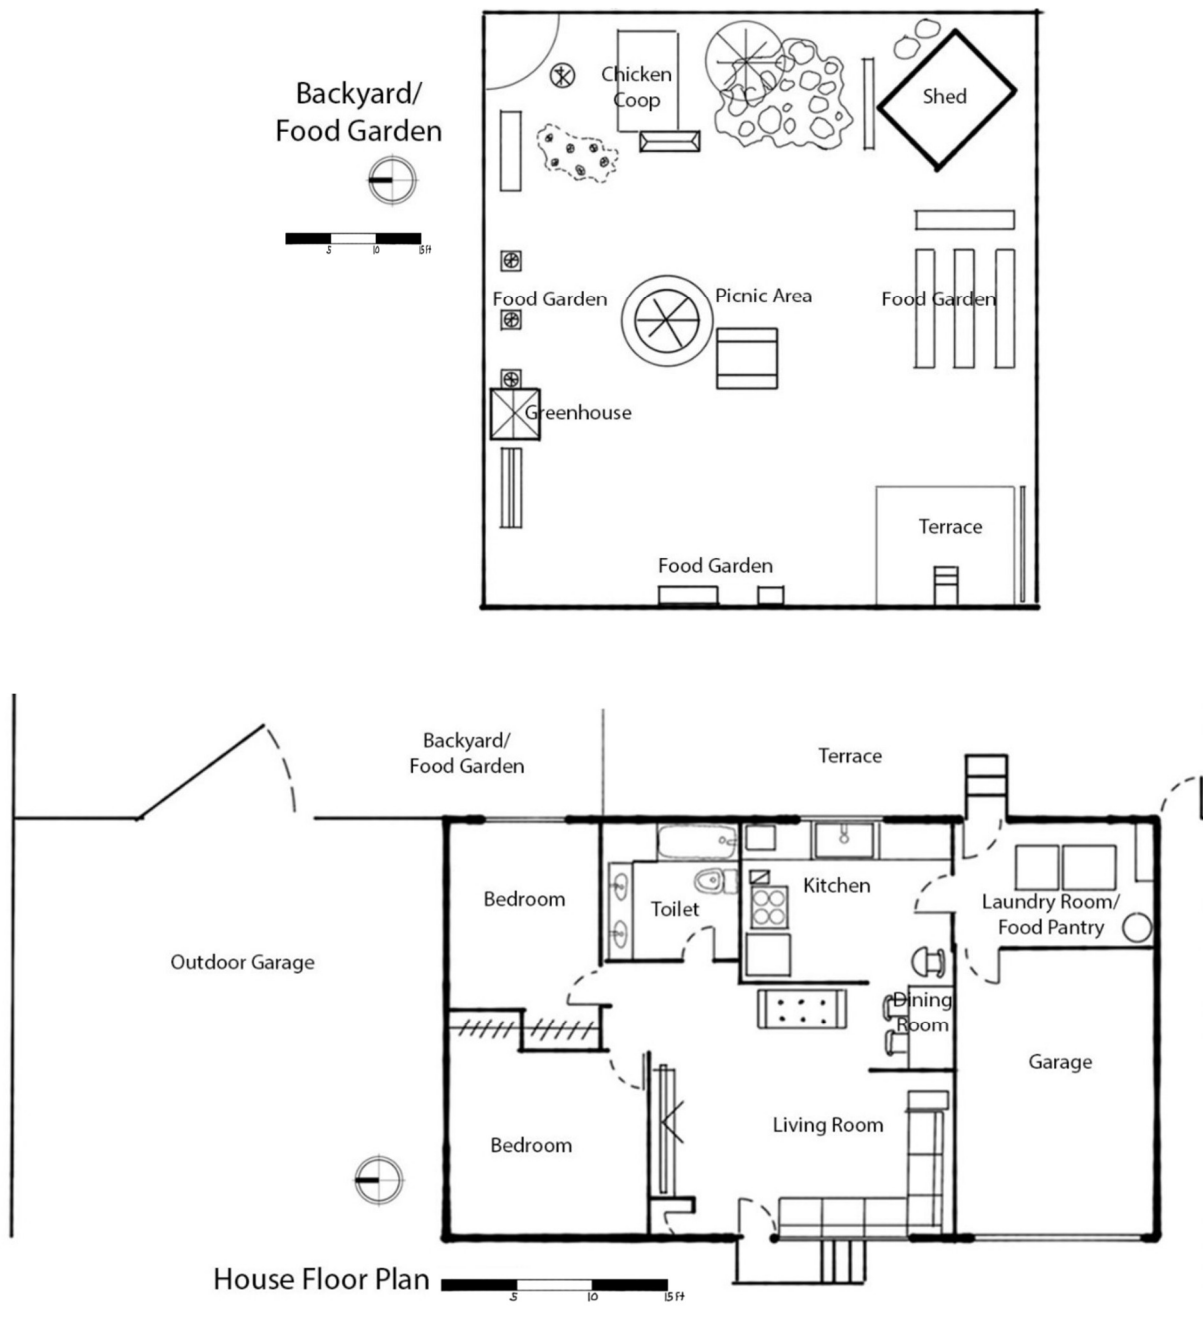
Floor Plan of Edelweiss' Home (bottom) & Site Plan of Garden (top)
